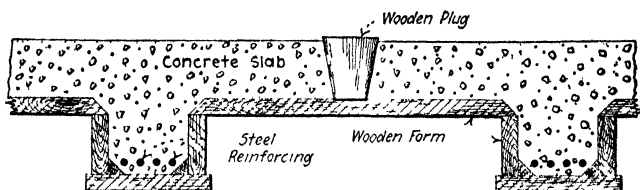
Method of providing space for later placement of conduit in building which has wooden floors on concrete slabs.
